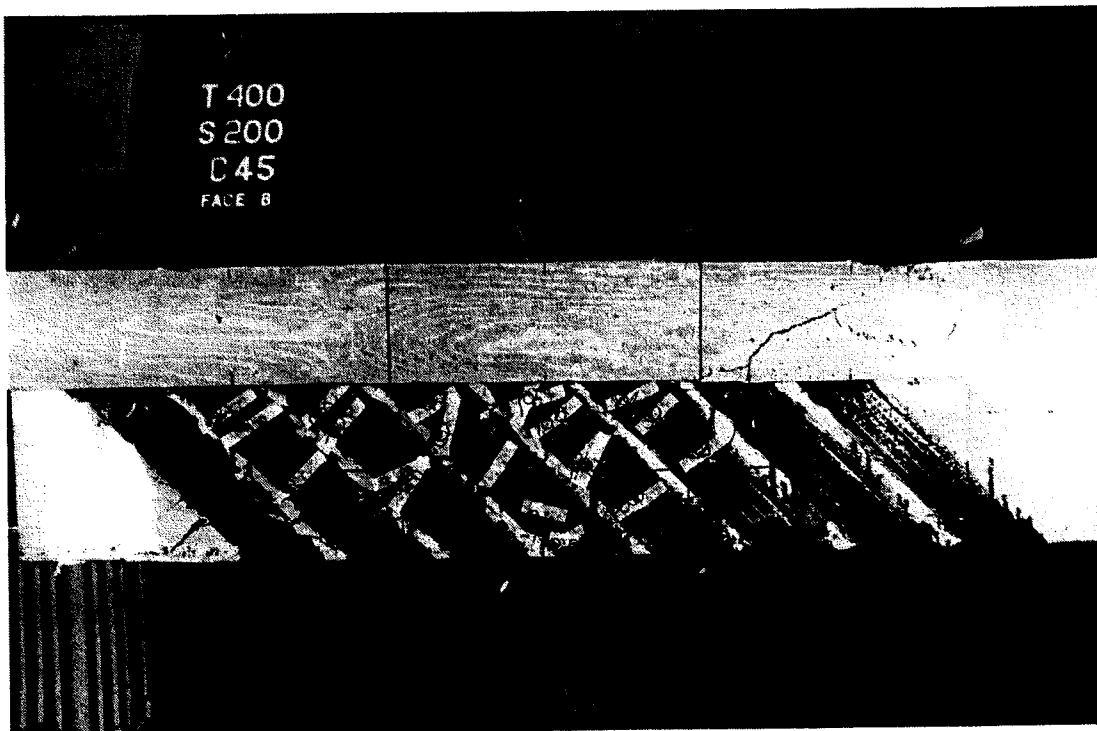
T4S2C45 Specimen after Failure (Face B)
